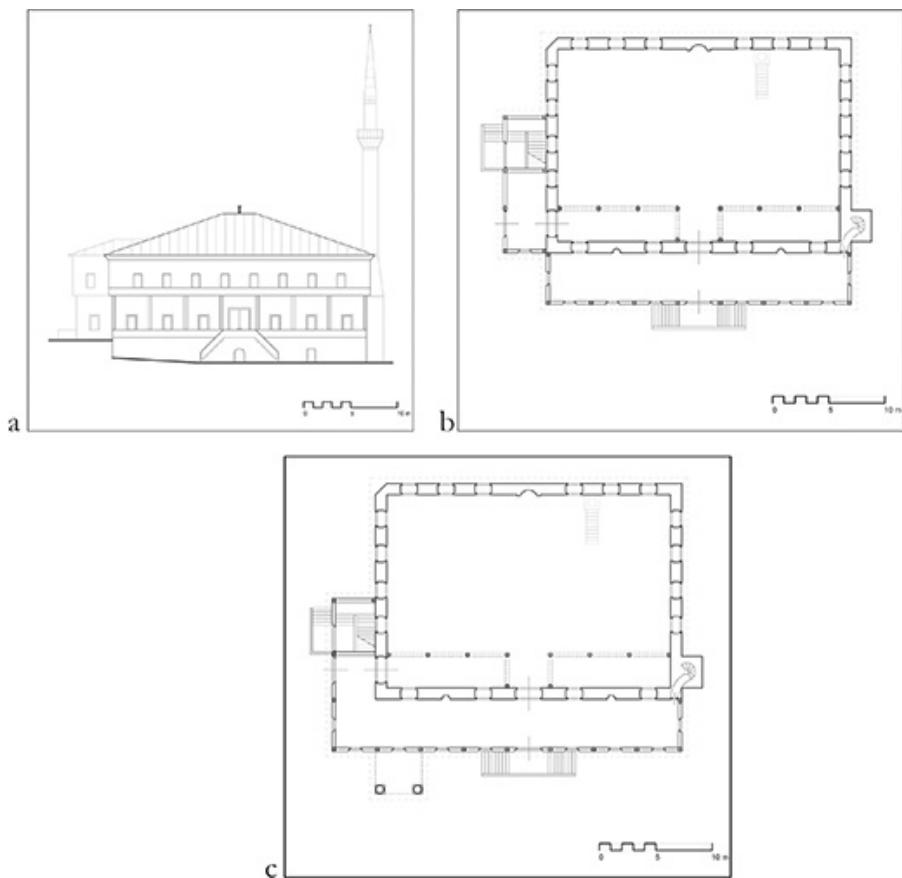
Partly conjectural view and ground-floor plans of the original layout of the Galata New Mosque: a. front view and b. ground floor plan before the restoration of 1821, showing the original form of the mosque; c. ground floor plan after the restoration showing the enlarged royal pavilion (all figures drawn by Erkan Torun).
